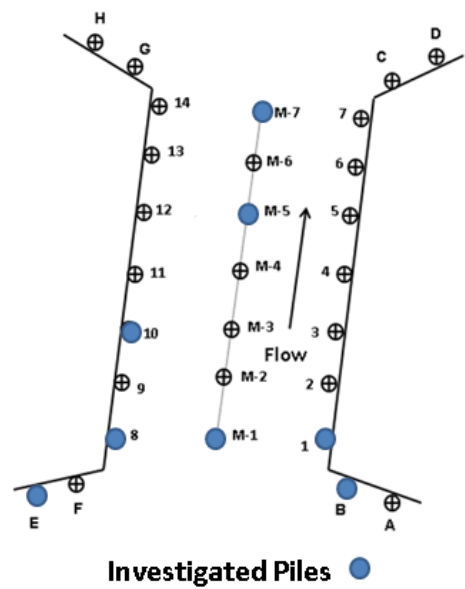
Foundation Plan and Investigated Piles of Bridge No. 1190
